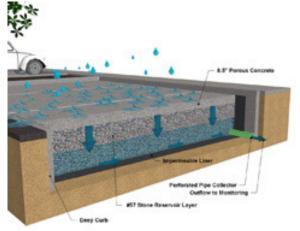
Example of how Permeable Pavement works http://www.floodcontrol.co.riverside.ca.us/LID.aspx#link
